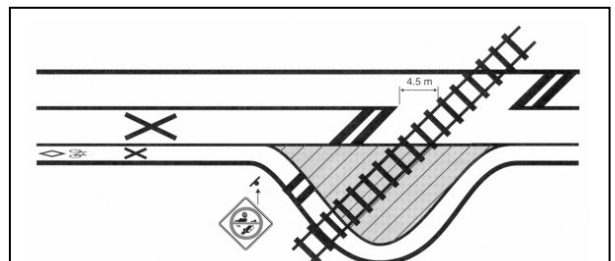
Skewed Railroad Crossing Unrestricted Right-of-Way Width
